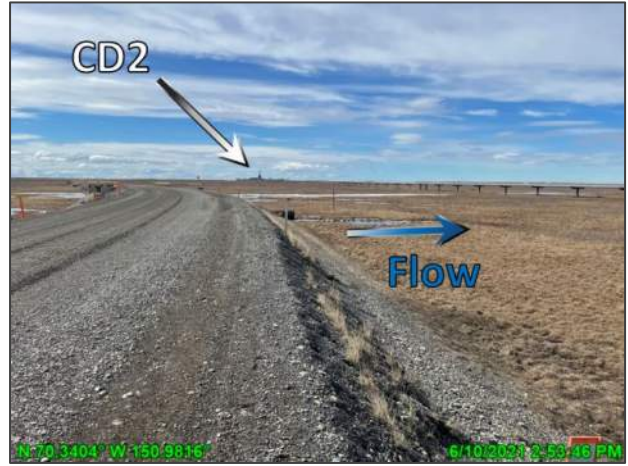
CD2 road embankment in between the short and long swale bridge, looking west; June 10, 2021
